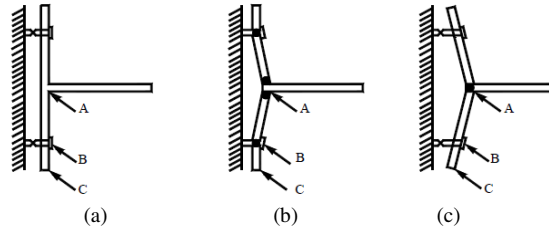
Failure modes of T-stub parts (a) Bolts failure (b) Plastic hinge failure of T-stub flange (c) Combined failure
